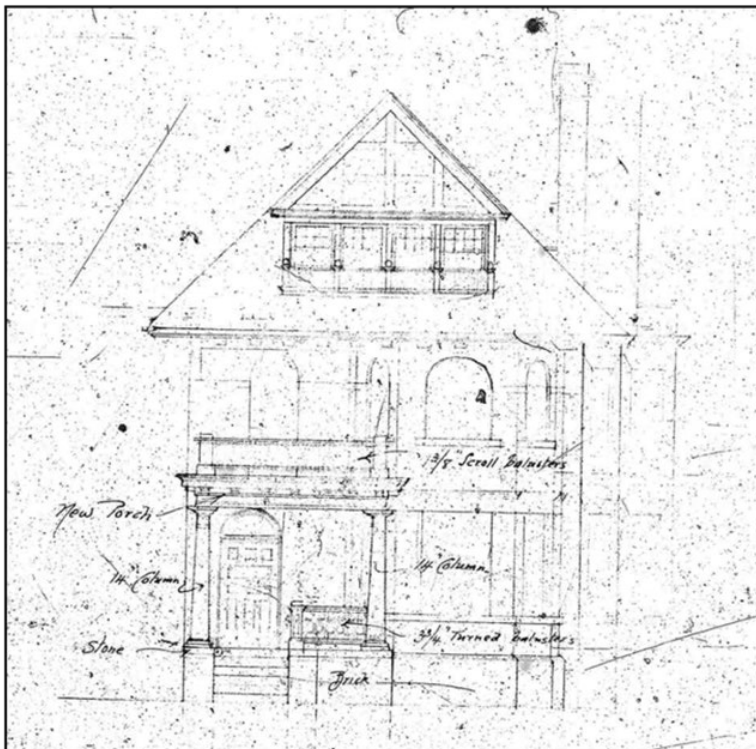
512 Jarvis Street, east elevation, 1925 (Building Records).
